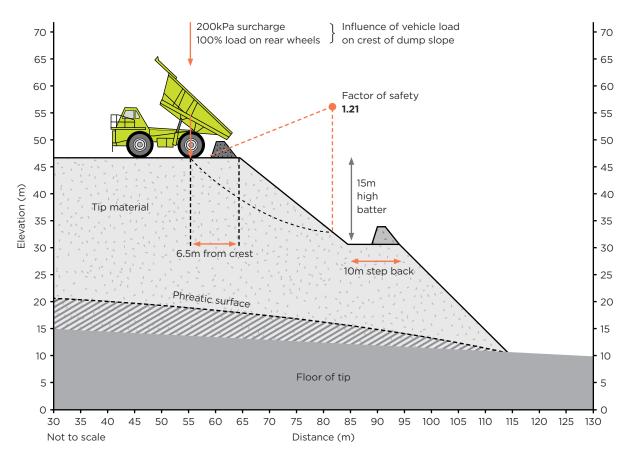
Example of tip slope stability design (limit equilibrium)
